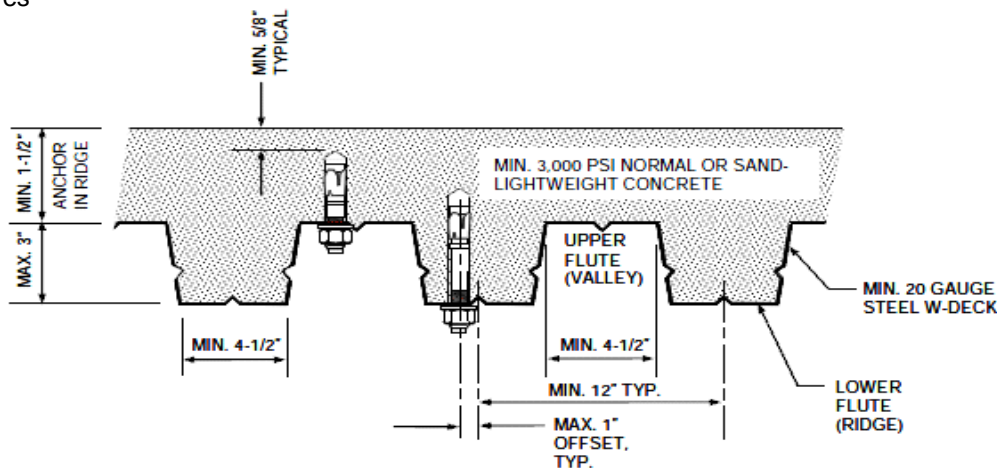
INSTALLATION IN THE SOFFIT OF CONCRETE OVER METAL DECK FLOOR AND ROOF ASSEMBLIES
